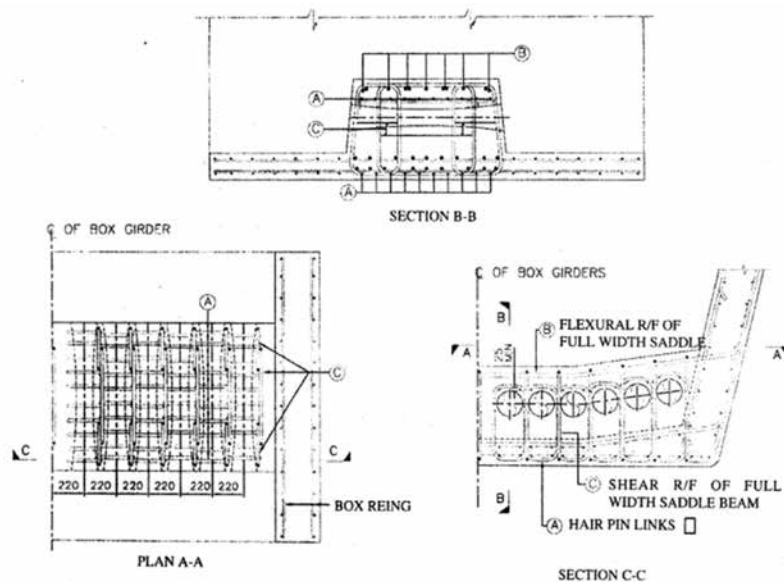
Reinforcement Details of Typical Full Width Saddle Deviator
